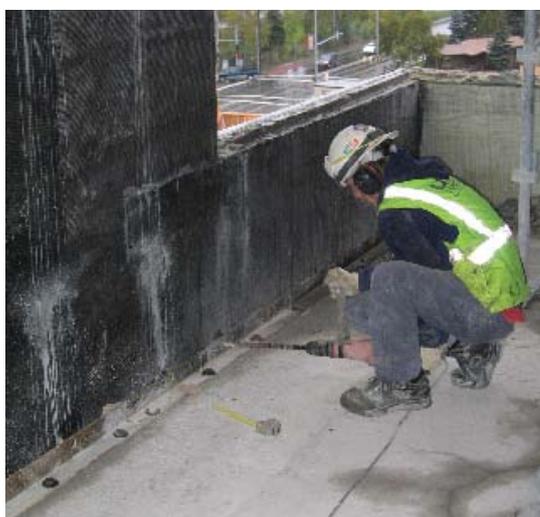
Steel angles and bolts for transfer of loads from shearwalls to floors
